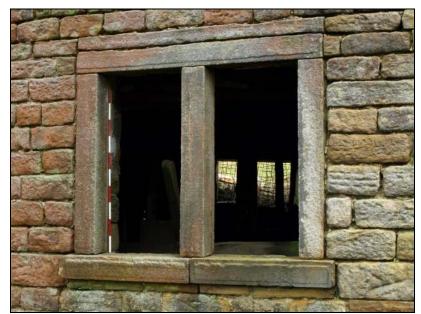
Detail of nineteenth century window in front elevation of farmhouse
